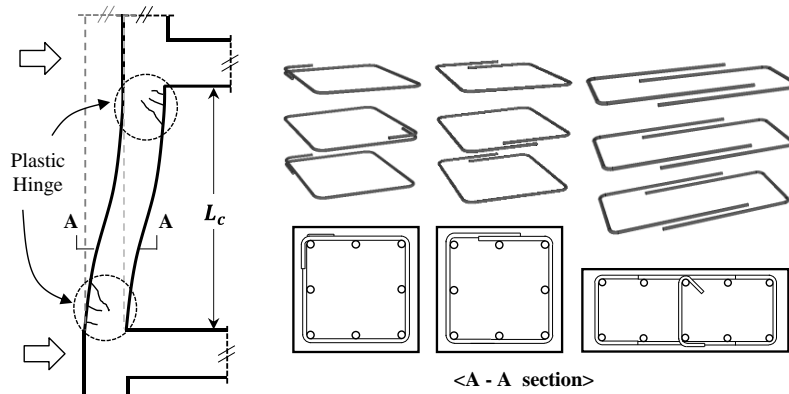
Behavior and reinforcement details of columns in gravity load-dominated moment frames
